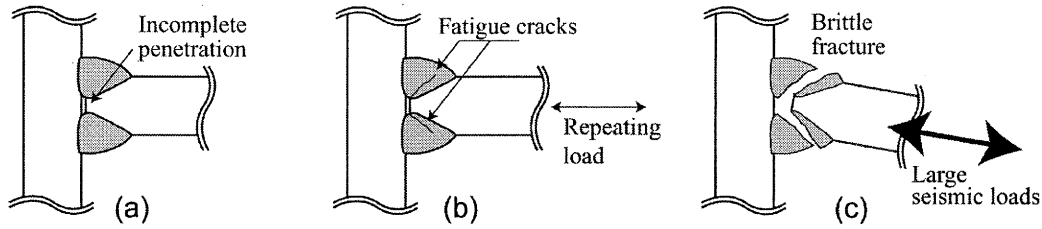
Damage Case of Structures: (a) Planar Defects in Weld Joints, (b) Propagation of Fatigue Cracks, and (c) Brittle Fracture due to Seismic Loads
